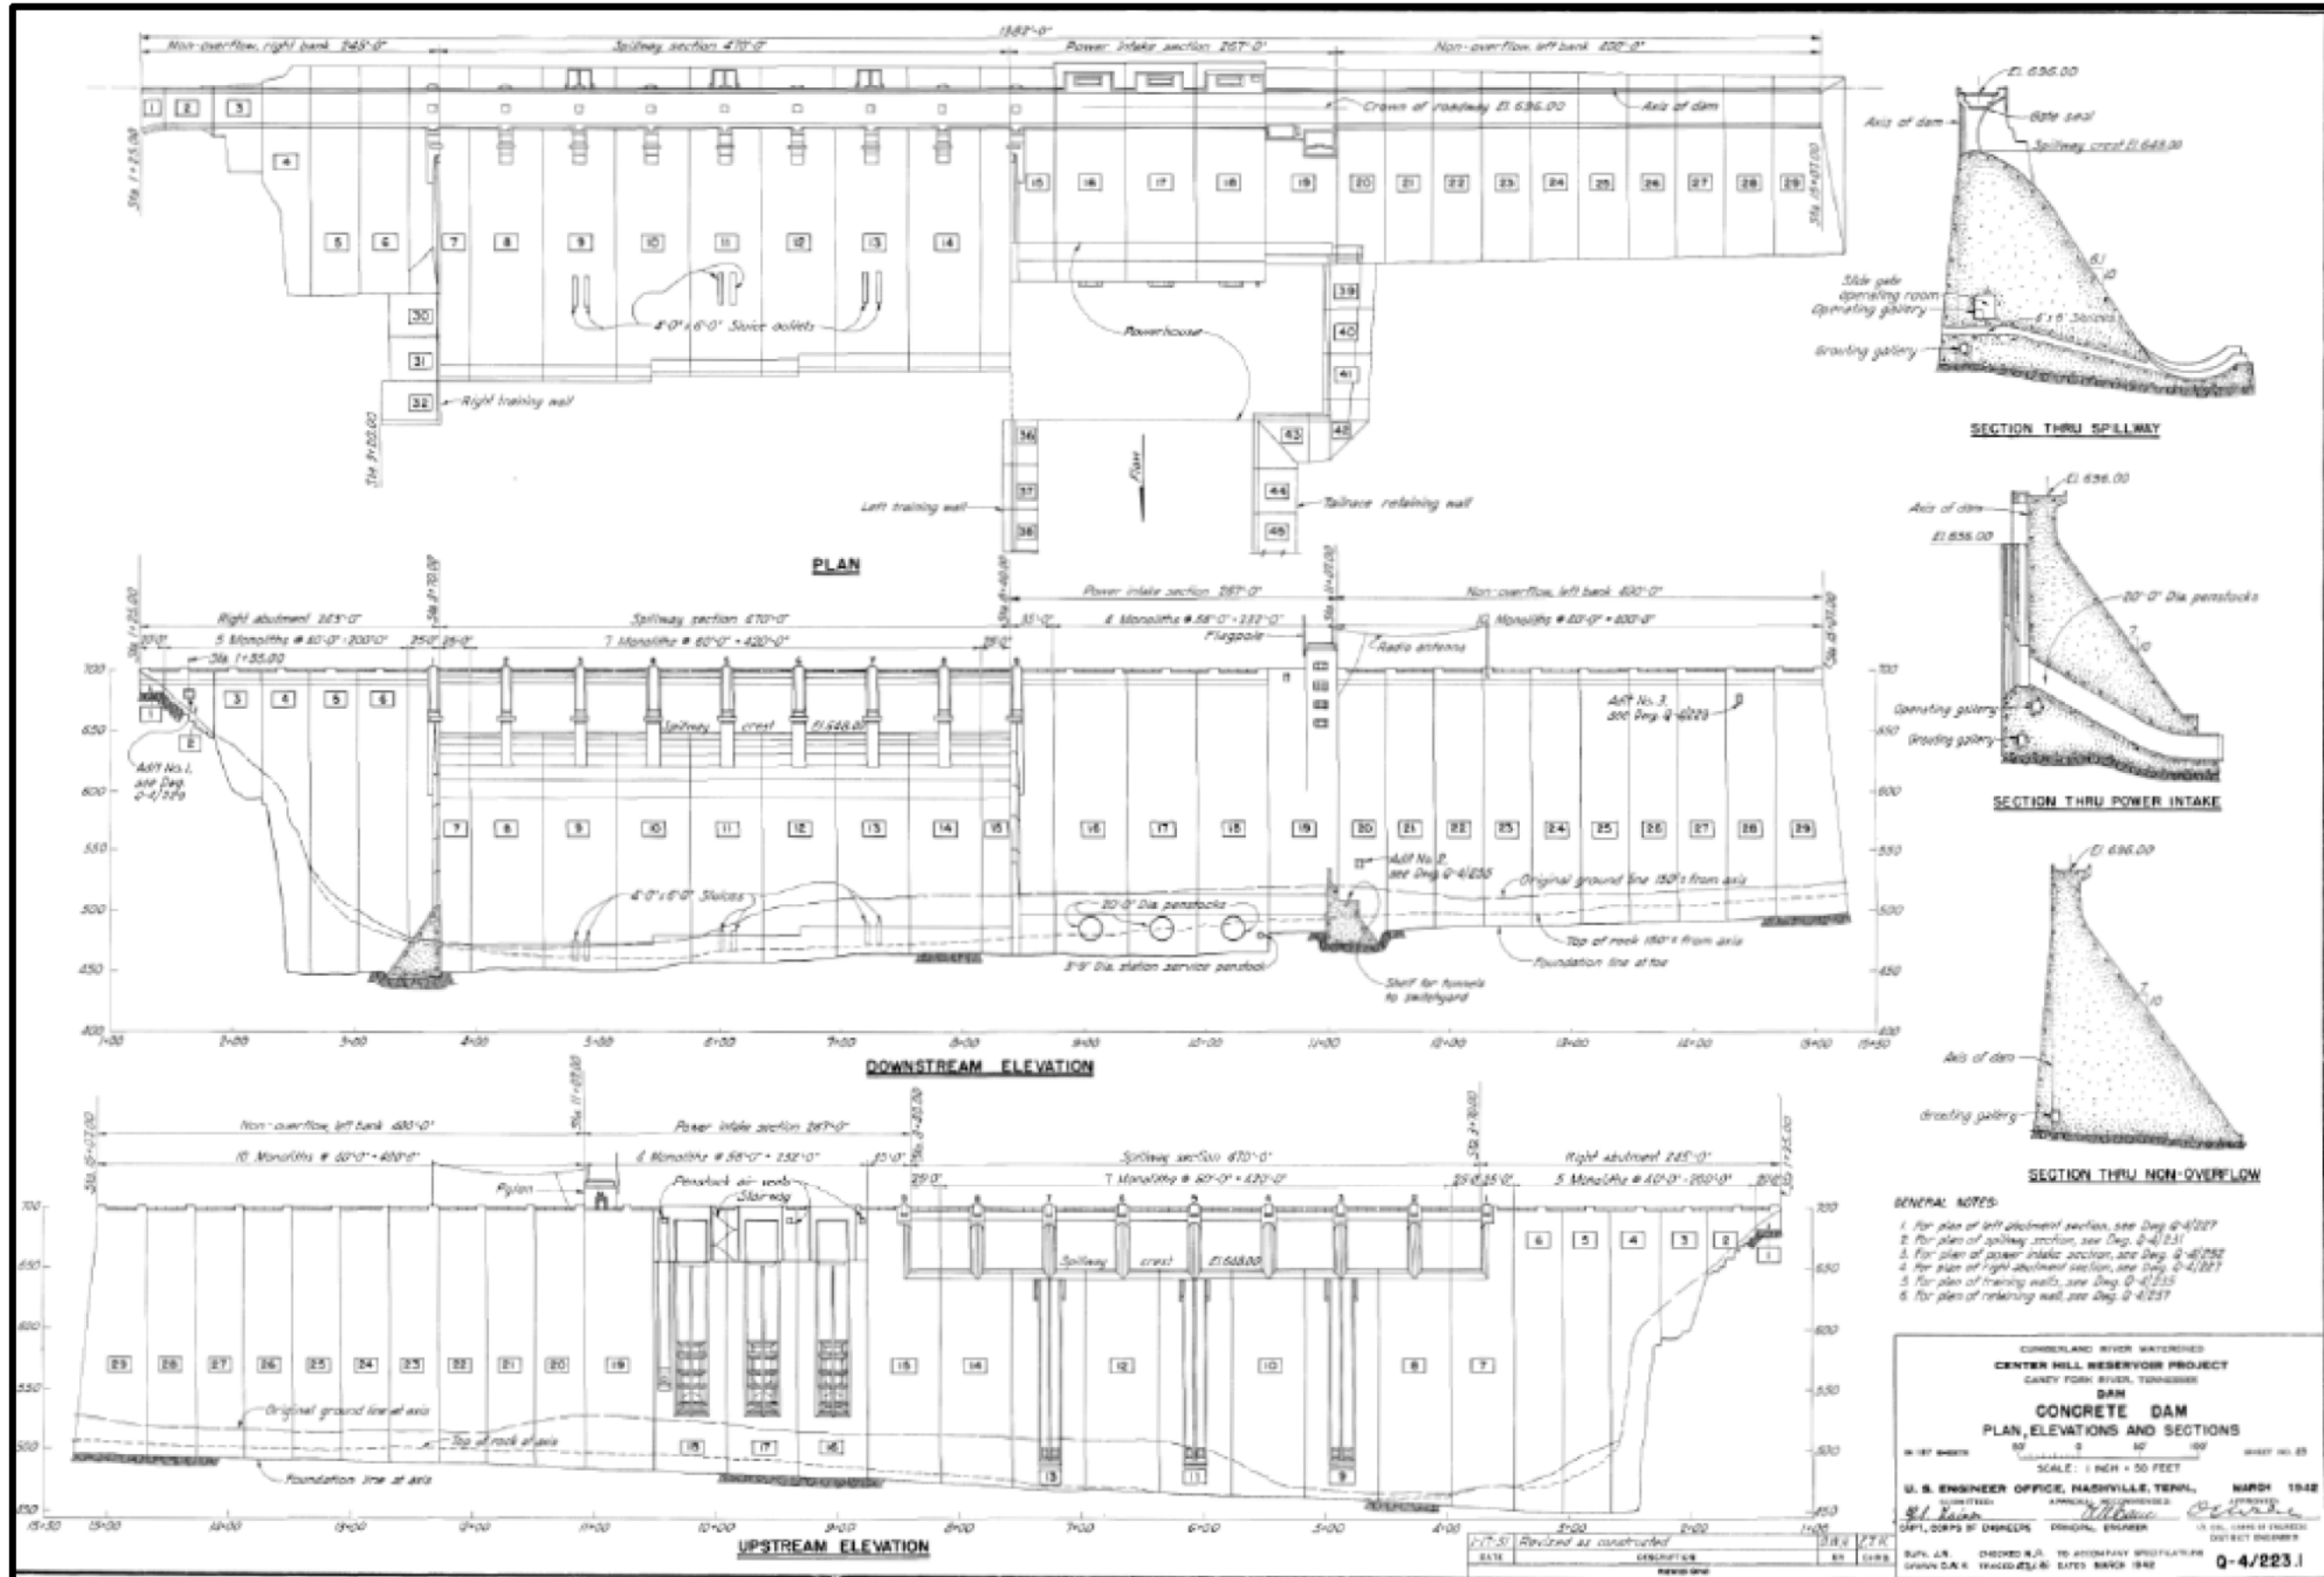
Center Hill Dam, Concrete Dam Plan, Elevations, and Sections
